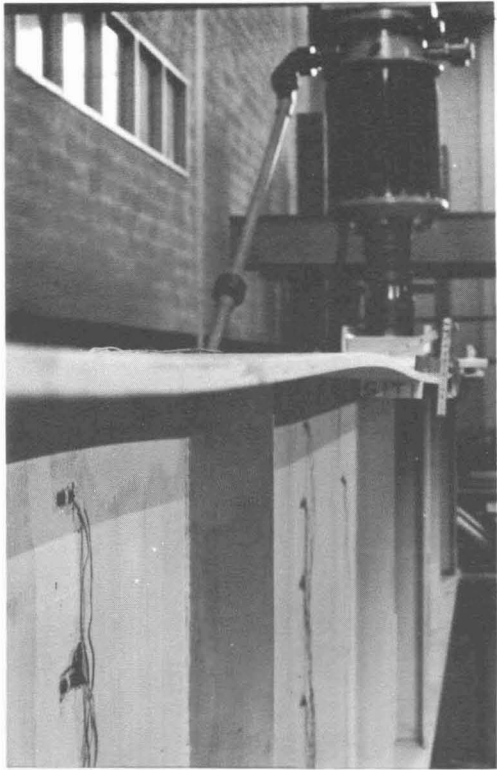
Flange Deflections in Girder G-1 (Load No. 7 and 8)
